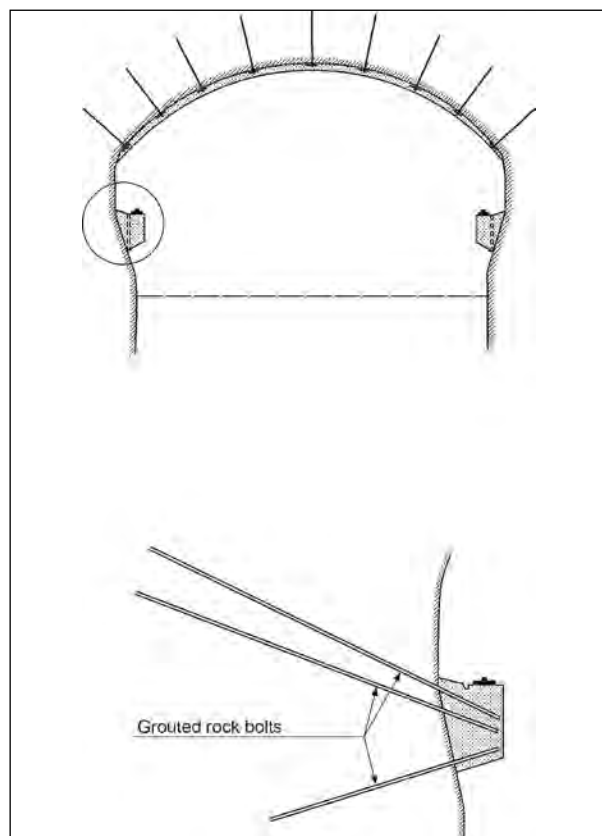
Steelfibre reinforced sprayed concrete arch and rock bolt supported crane beam.
